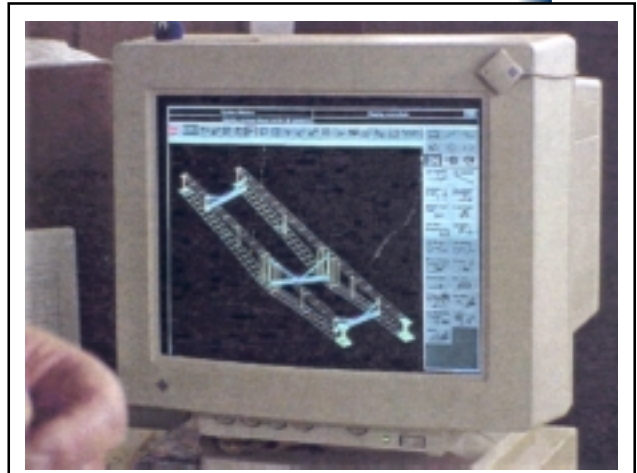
CAD of girder bridge and cross frames used by Fairfield-Mabey.
